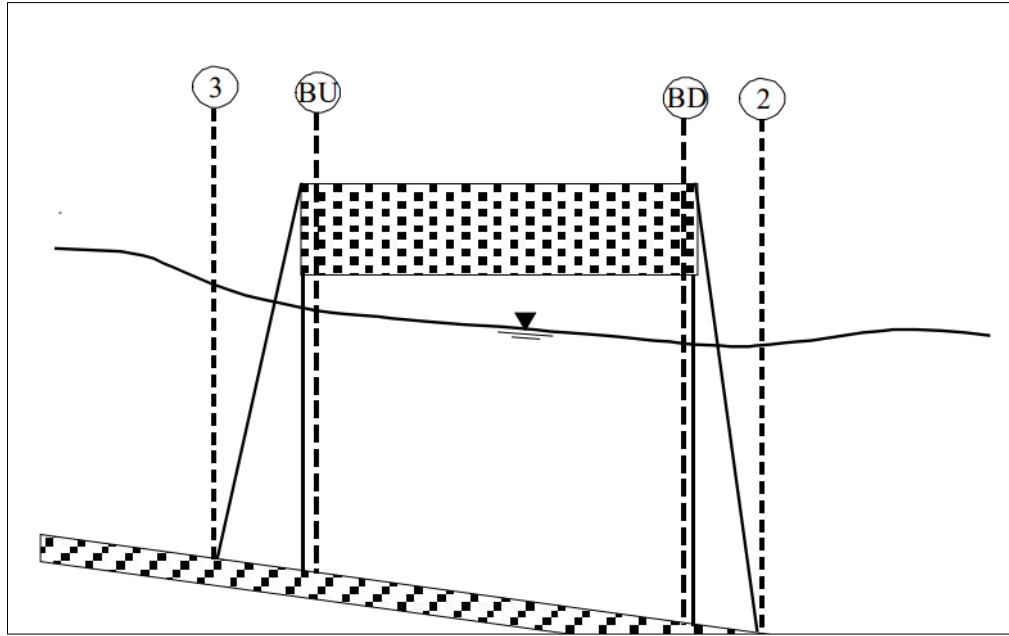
Cross Sections Near and Inside the Bridge (Brunner and CEIWR-HEC, 2020)
